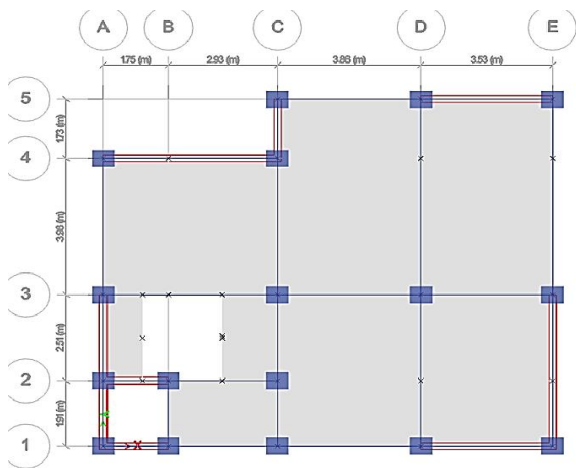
Model (2) G+ 20 Residential construction models with shear walls in plan view
